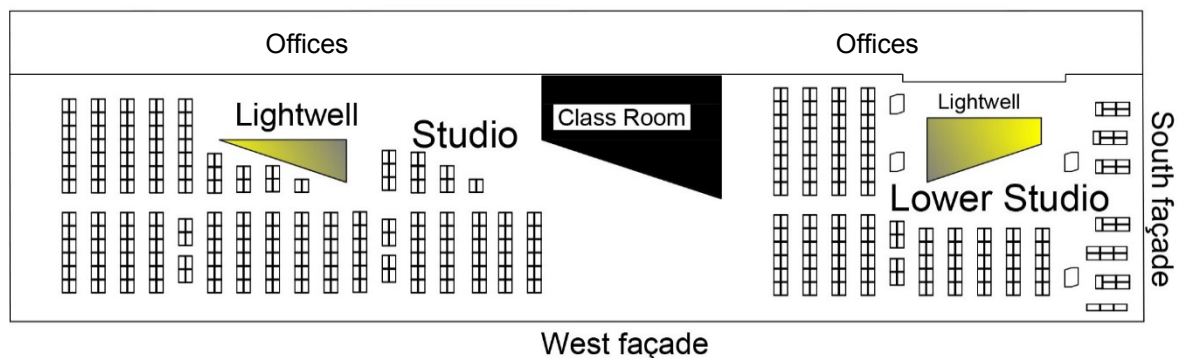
Light wells, west façade and south façade locations. West and south façades might cause over lit areas as some of the desks are located next to these façades and light wells should be designed for avoiding over-lit and non-lit circumstances.
